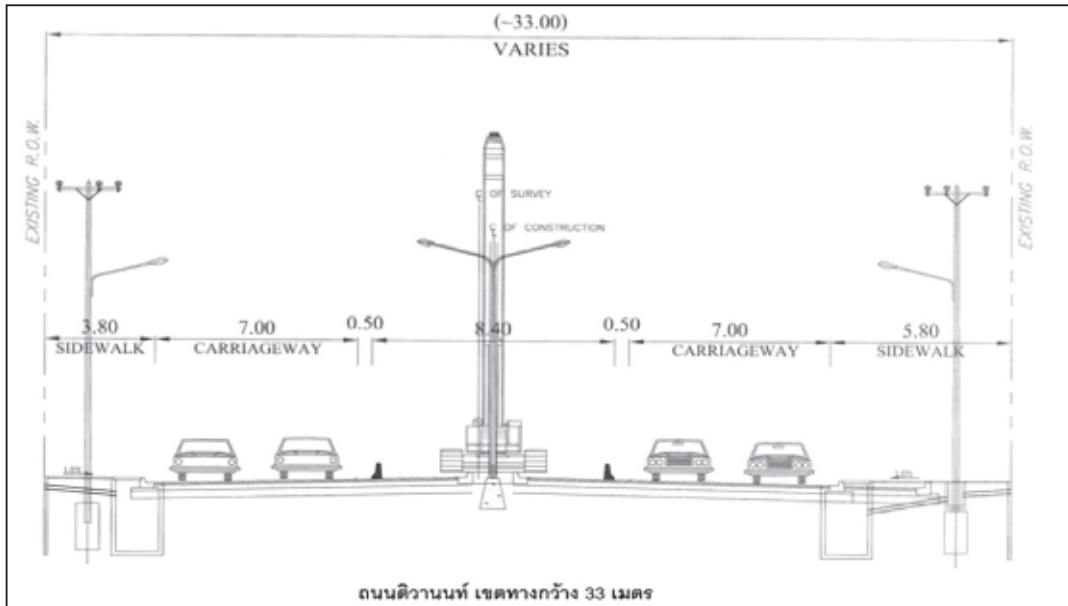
Traffic Condition during Construction on Tiwanon Road
